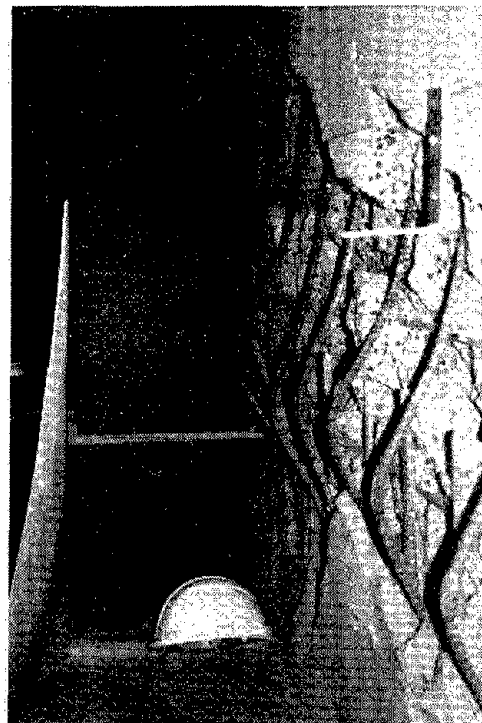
Rebar buckling in the damaged SRC structural wall
